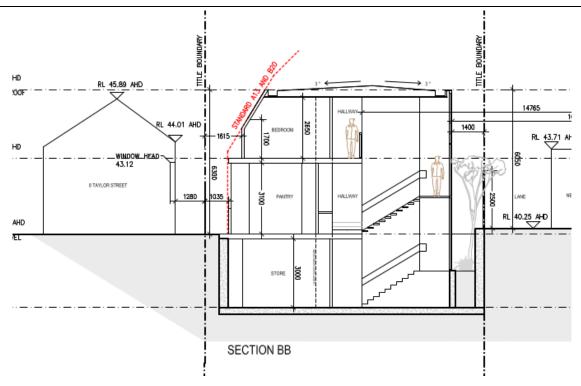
A cross-section of the proposed development with the setback requirements of Standard A13 shown in red.
